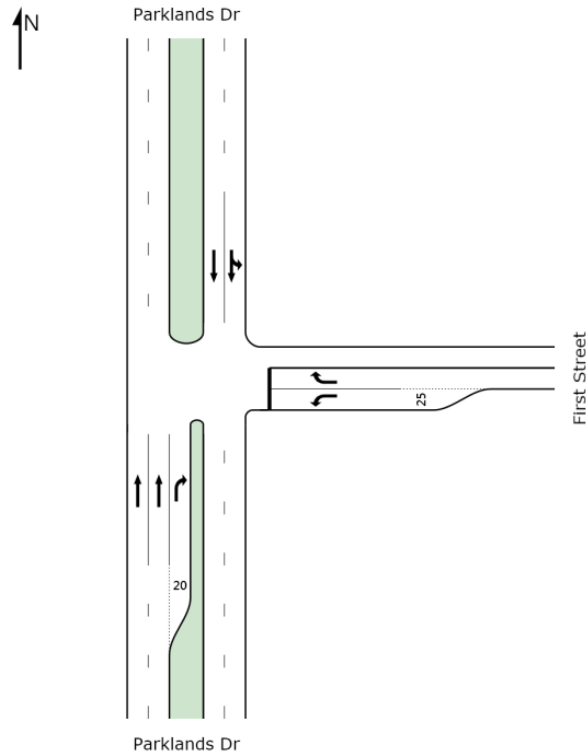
Parklands Drive / First Street – SIDRA Intersection Layout
